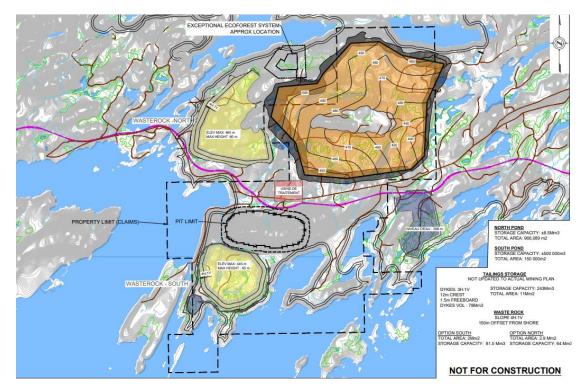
Outline of Mine, Tailings, Waste Rock and Plant Locations
